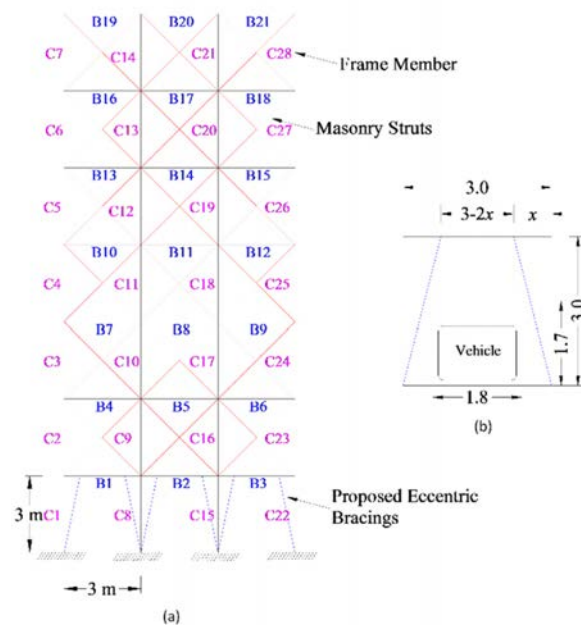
(a) Dimensions of frame member; (b) detail of proposed eccentric bracing.
